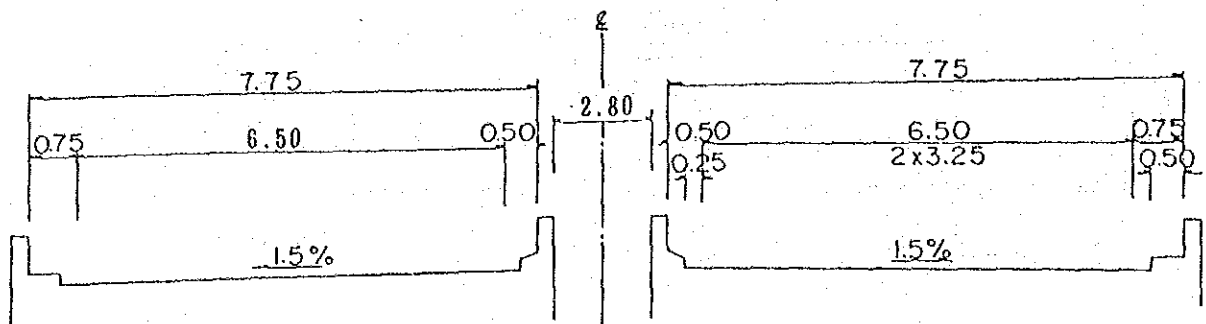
Typical Cross Section for 4 Lanes Two Ways, Viaduct
